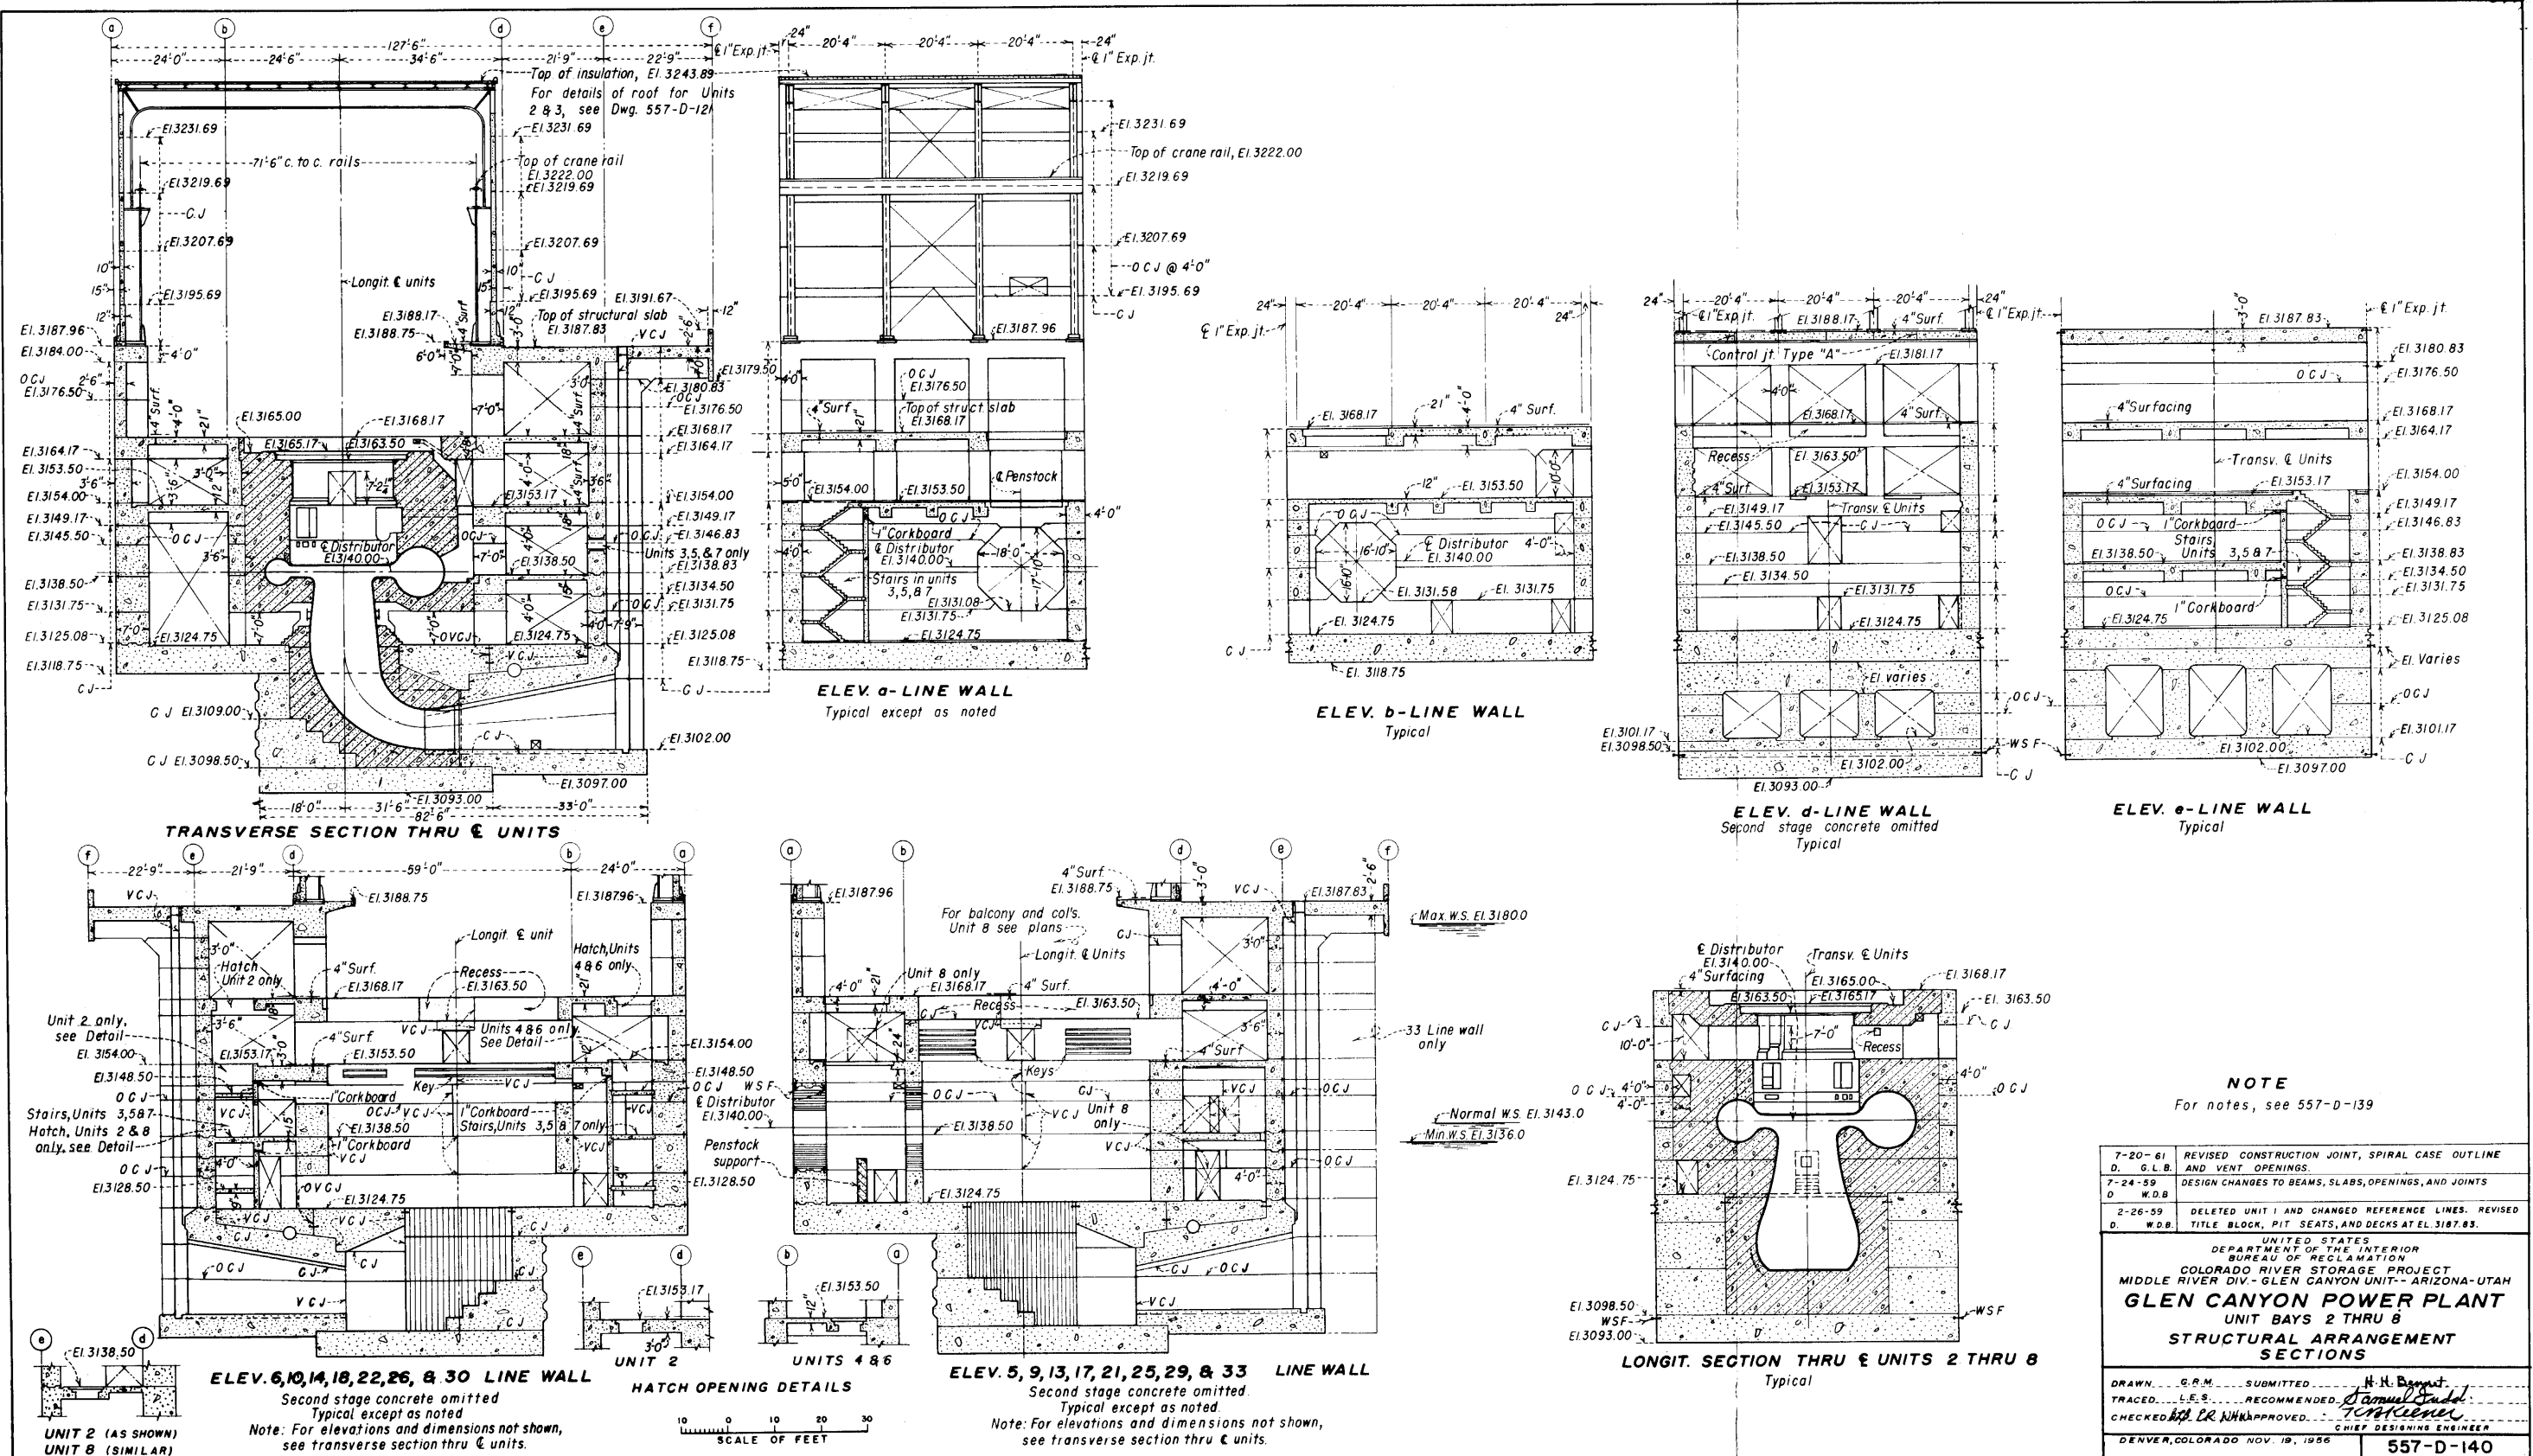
Powerplant structural arrangement plans—Unit bays 2 through 8.
